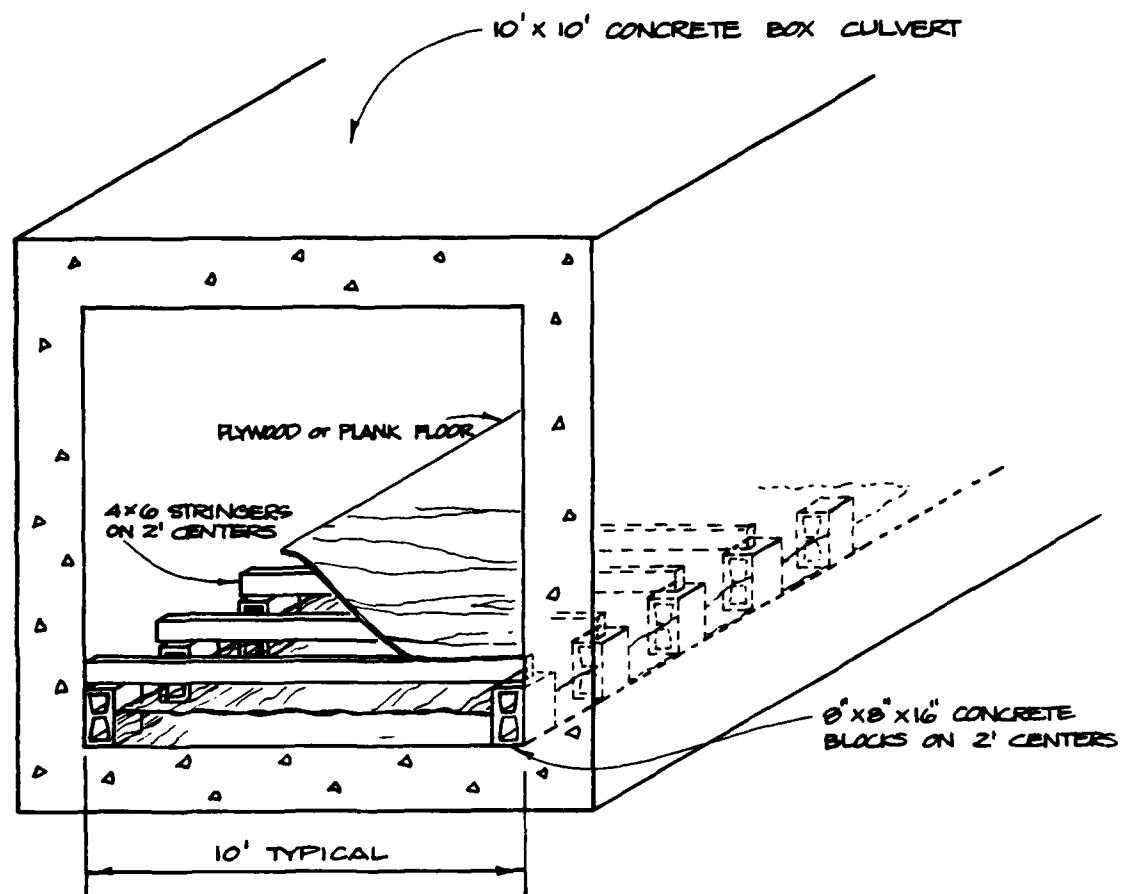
Box Culvert Key Worker Shelter With Low-Flow False Floor.
